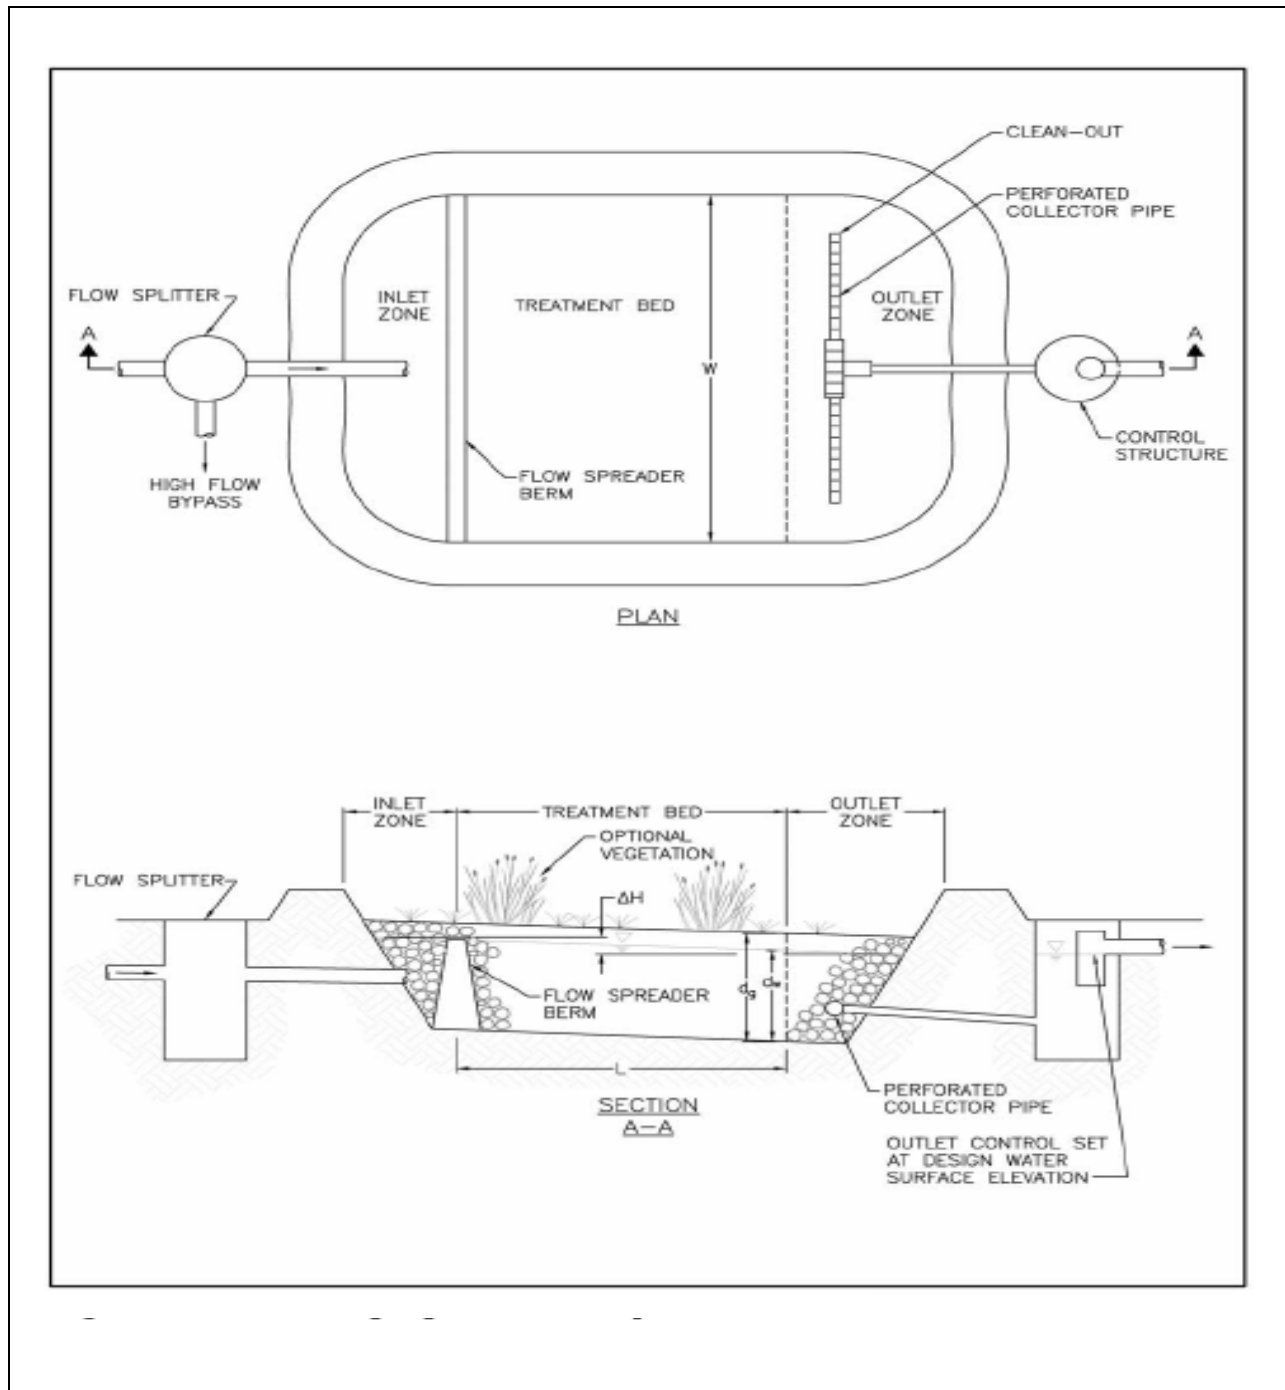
Submerged gravel biofilter: plan and section.
